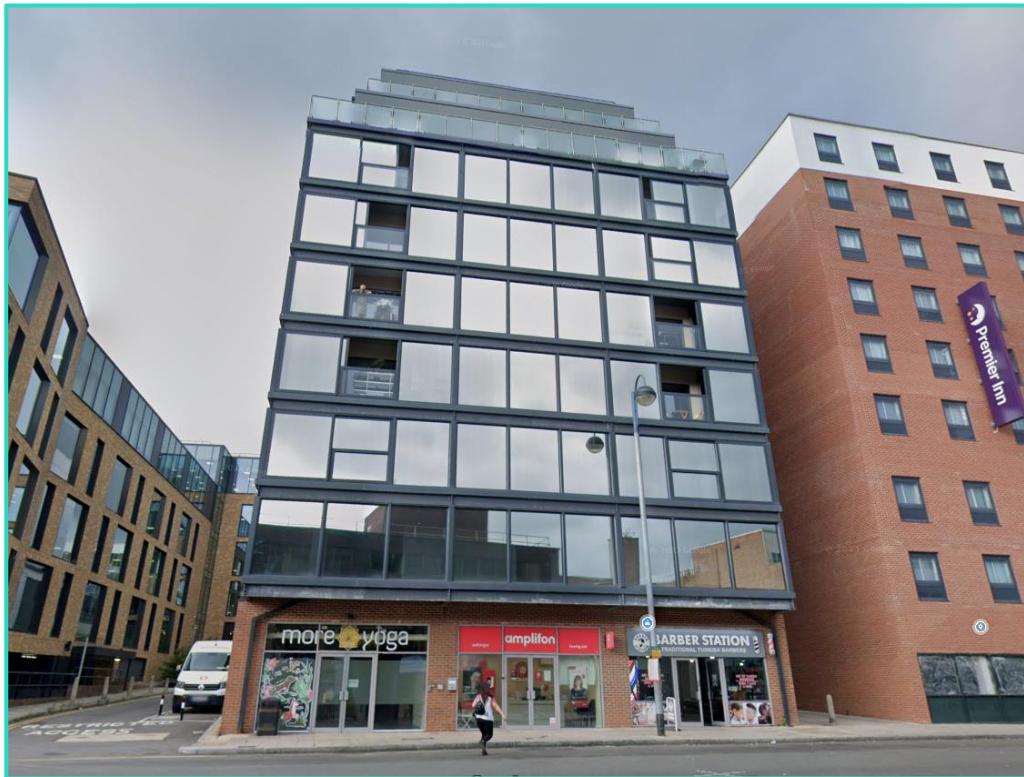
1-3 Bakers Road – Street view image of 1-3 Bakers Road and the external glazed screen (a number of panels retracted)
